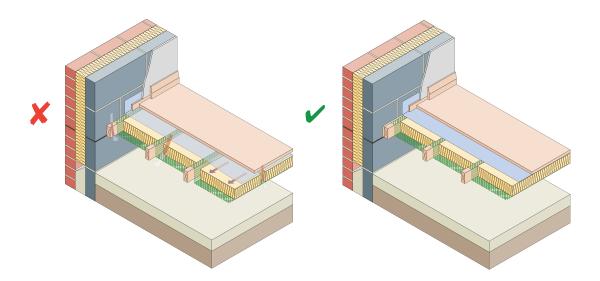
To avoid heat losses through the vented, suspended timber floor construction, ensure the insulation is tightly fitted between the floor joists and is in full contact with the underside of the floor deck. The perimeter joists should be sealed to the perimeter wall to prevent air ingress and subsequent heat loss. To ensure continuity of the building's airtightness, the air barrier should be turned up at the perimeter wall and overlapped by the plaster finish.
